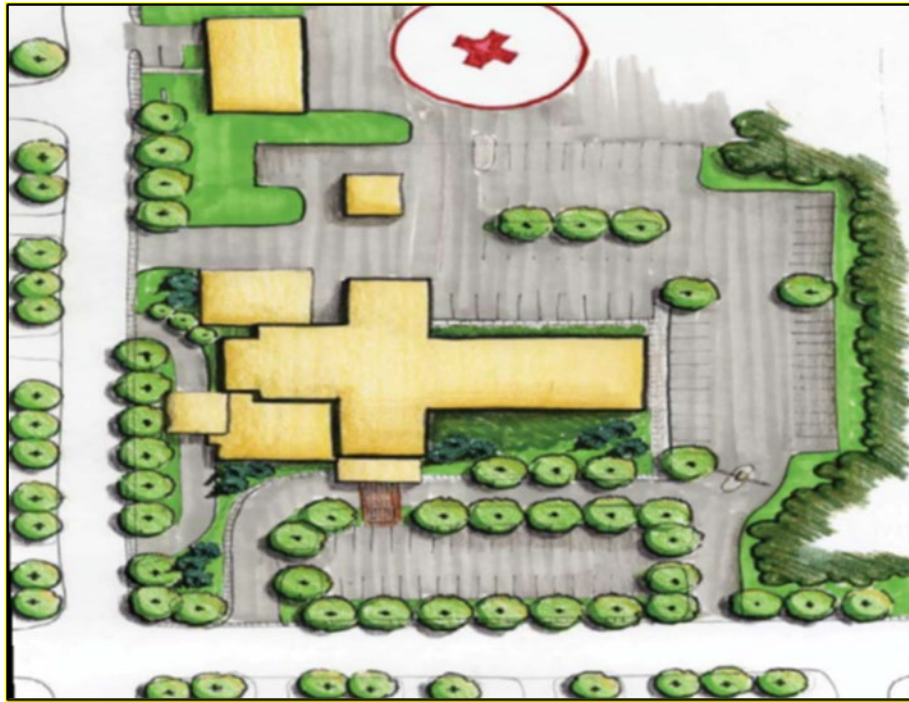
An example of a medical clinic or hospital site showing parking located at the rear and exterior side yards. Within the side yard, parking areas are heavily screened with vegetative buffers.
